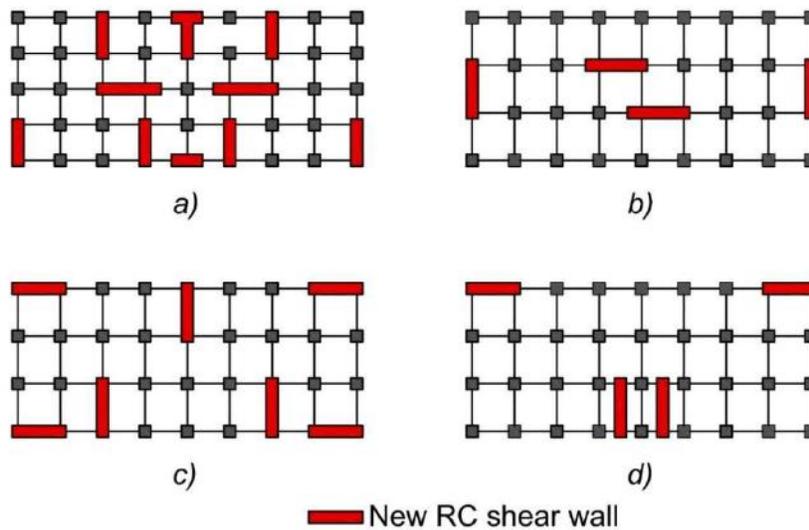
Possible layouts of new structural elements (RC shear walls) for retrofitting an existing RC structure (based on UNIDO, 1983).
